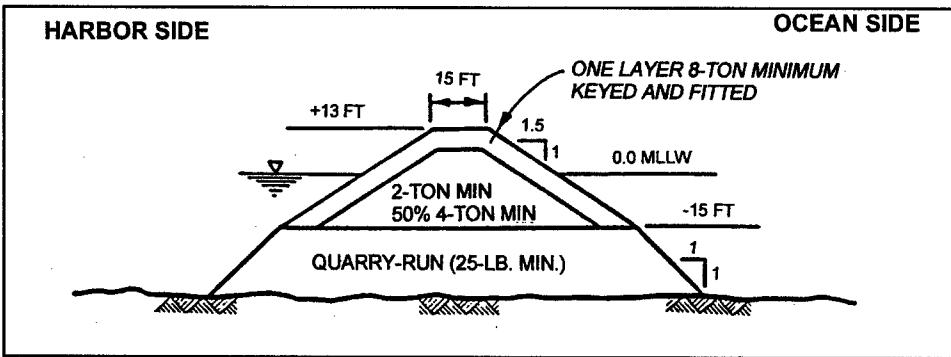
Typical cross section of 1931 Kahului breakwater trunk construction
